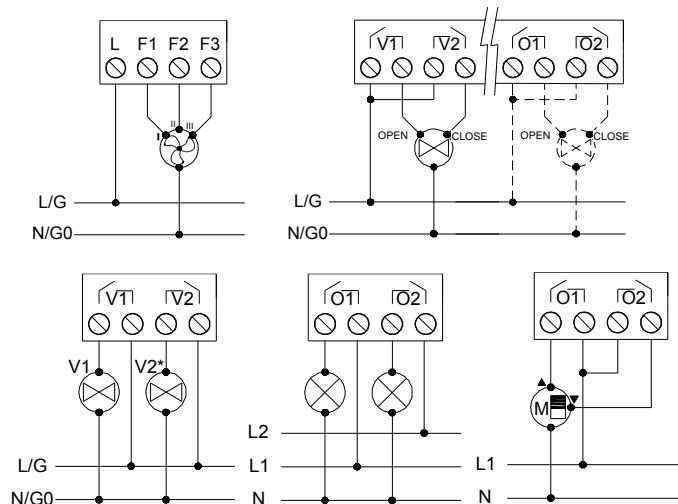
Wiring example (from top to bottom and left to right): Three-speed fan, 1 or 2 three-point valves, 2 open/close valves, 2 loads connected to different phases and shutter channel.
